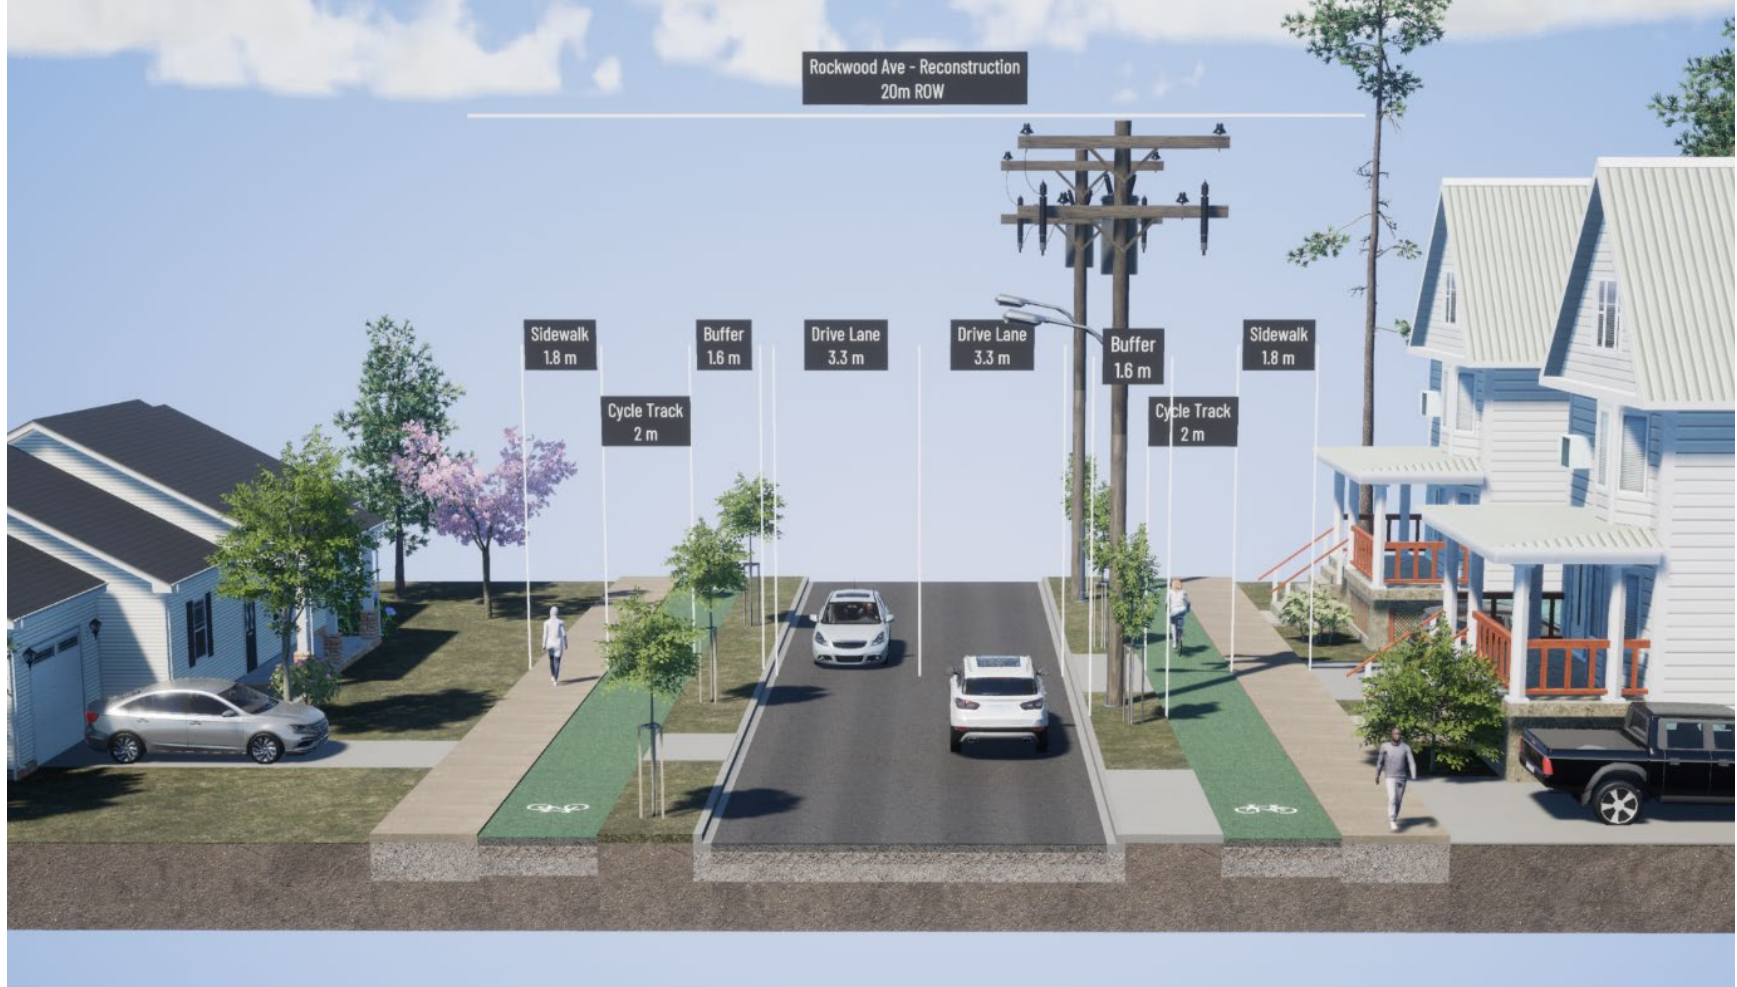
Rockwood Avenue Connector Route - Reconstruction with Cycle Tracks
